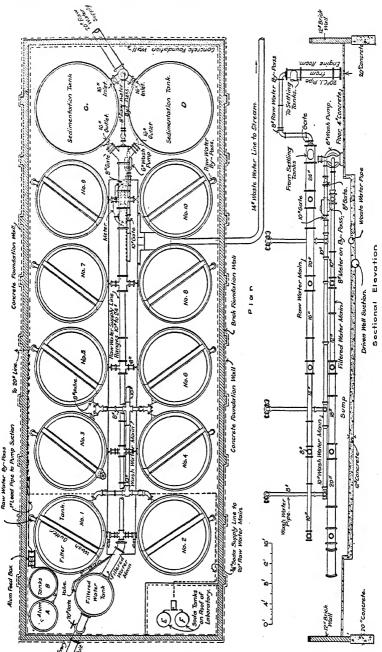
Mechanical filter plant at Baisley's Pond, Brooklyn, N. Y.
